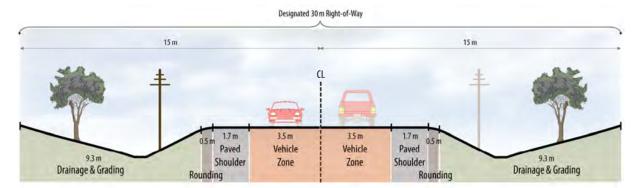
11.4 m Platform Rural Cross-Section for Bush Street
